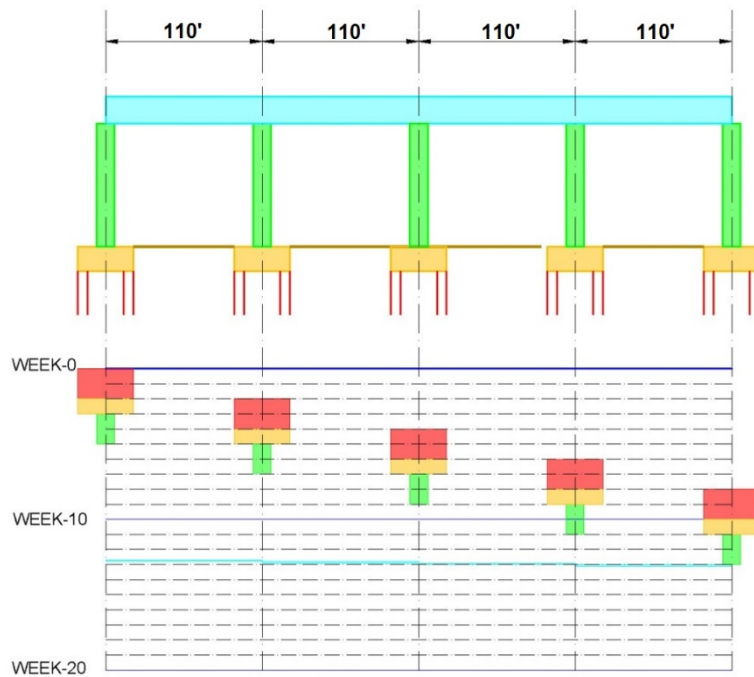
Precast-Prestressed Box Girder (Full Span) Sequence and Production Rate
